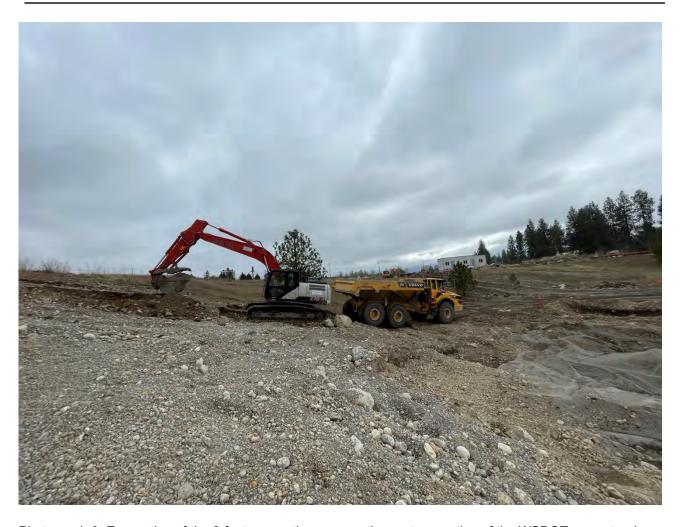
Excavation of the 2-foot Pentzer property excavation area. Excavated materials were transferred to the former UPRR dross stockpile area.
